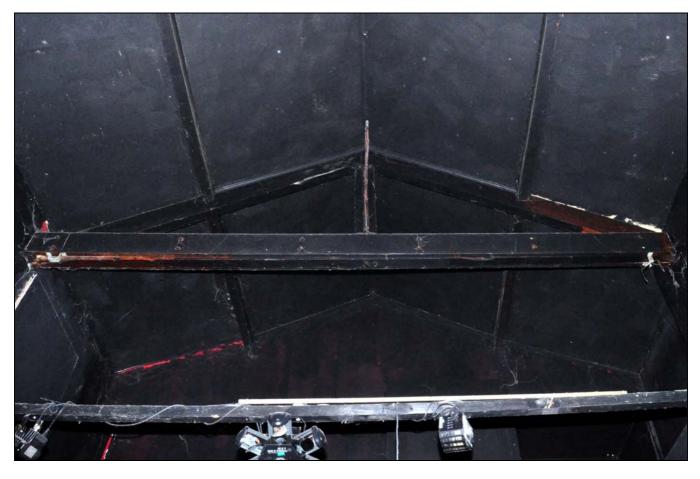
First floor: roof truss over former Club Room, now exposed over modern dance-floor
